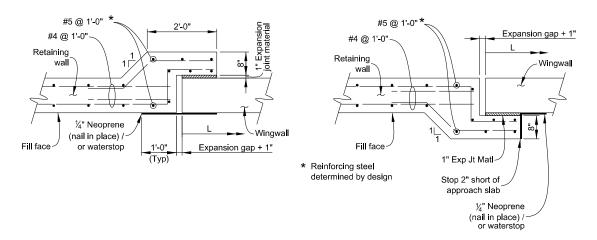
Wingwall to Retaining Wall Connection Detail
